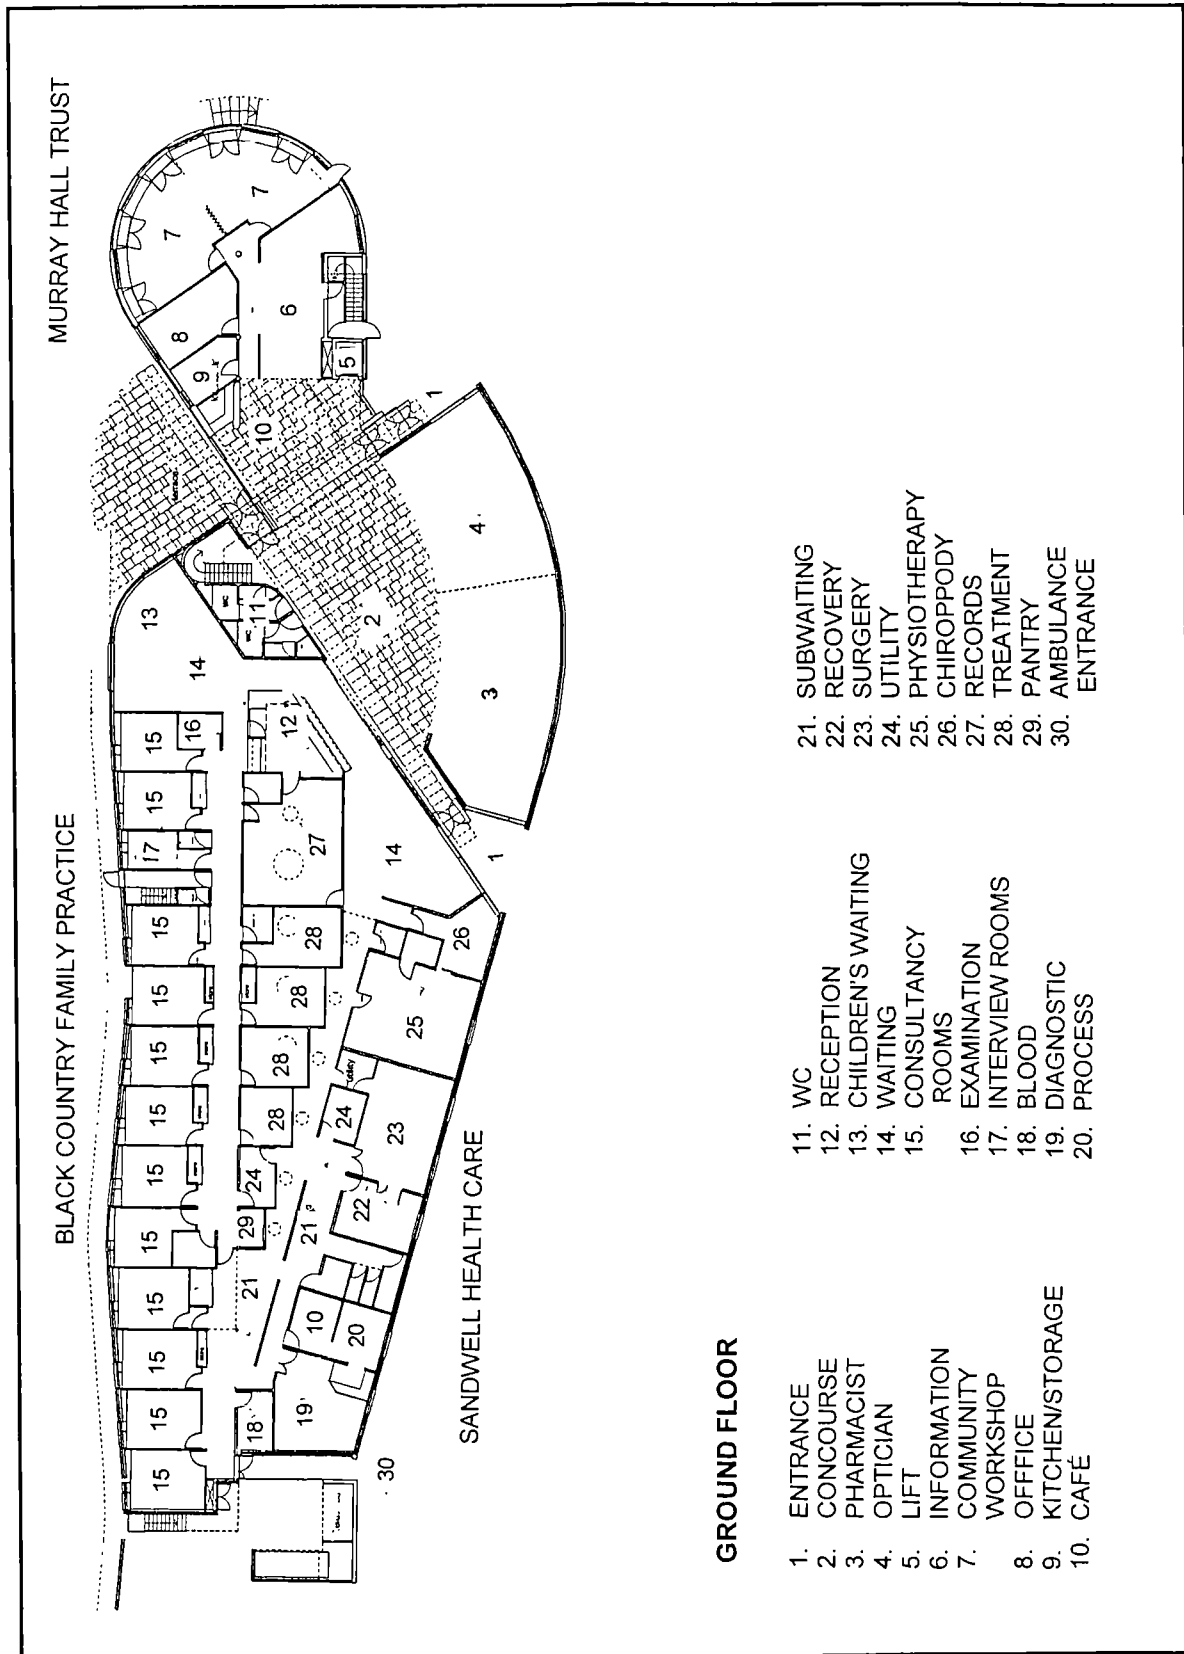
Neptune Health Park: Ground Floor Plan. Architects: Penoyre & Prasad
